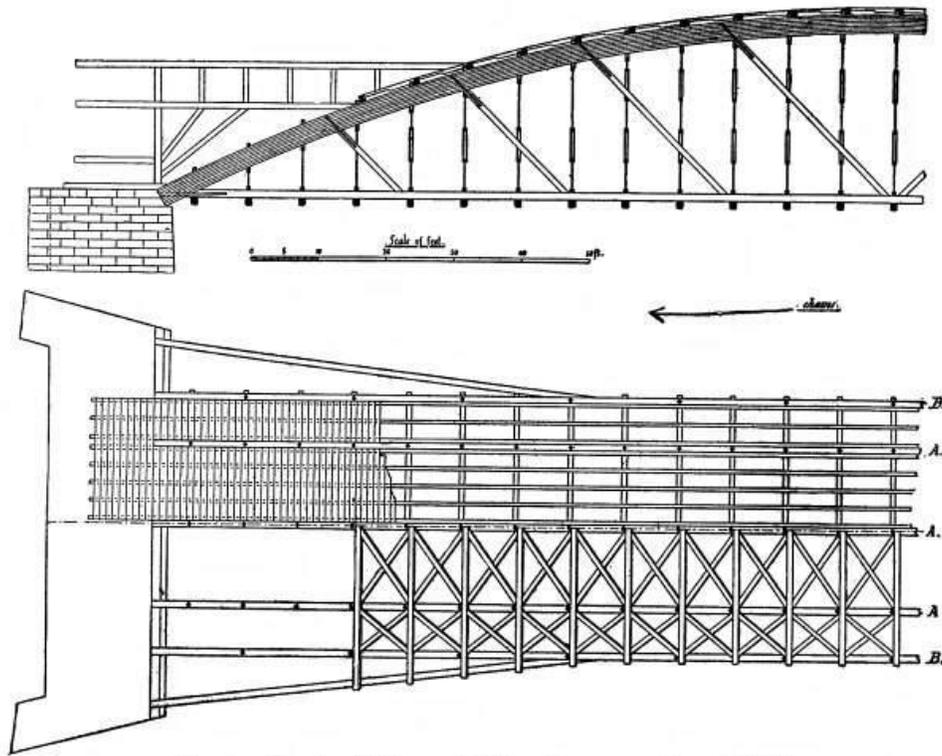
Burr's bridge across the Delaware River south of Trenton, New Jersey (1806). From Theodore Cooper, "American Railroad Bridges," *Transactions of the American Society of Civil Engineers* 21 (July 1889): Plate VII.
